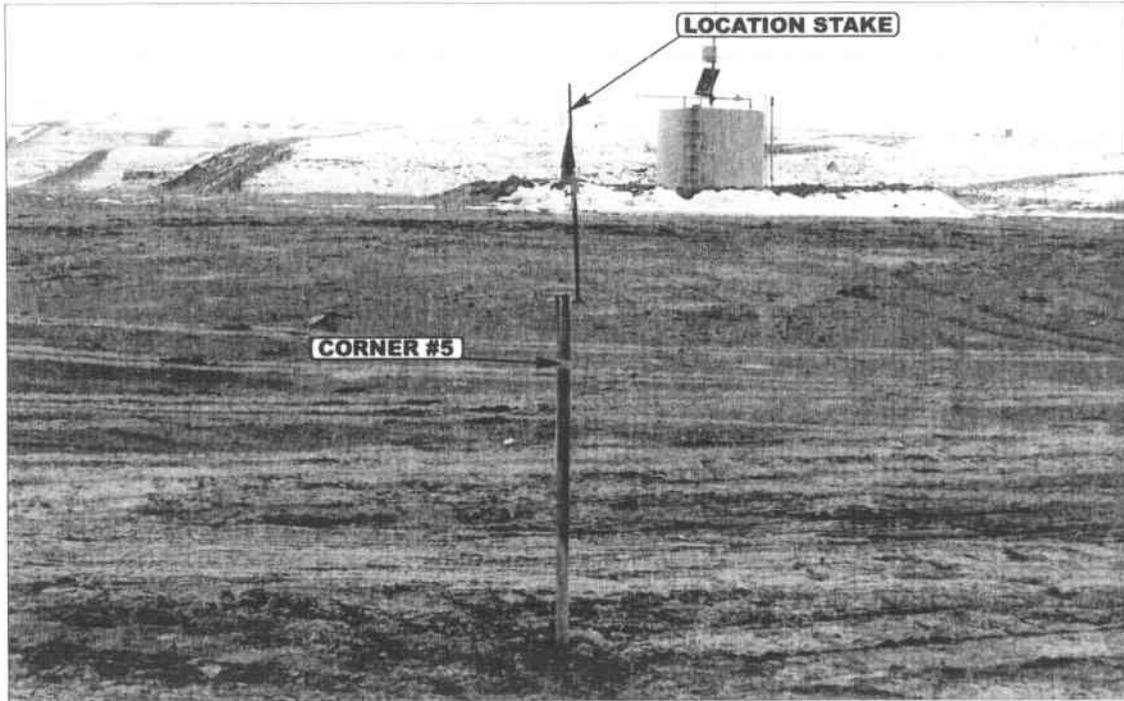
PHOTO: VIEW FROM CORNER #5 TO LOCATION STAKE
